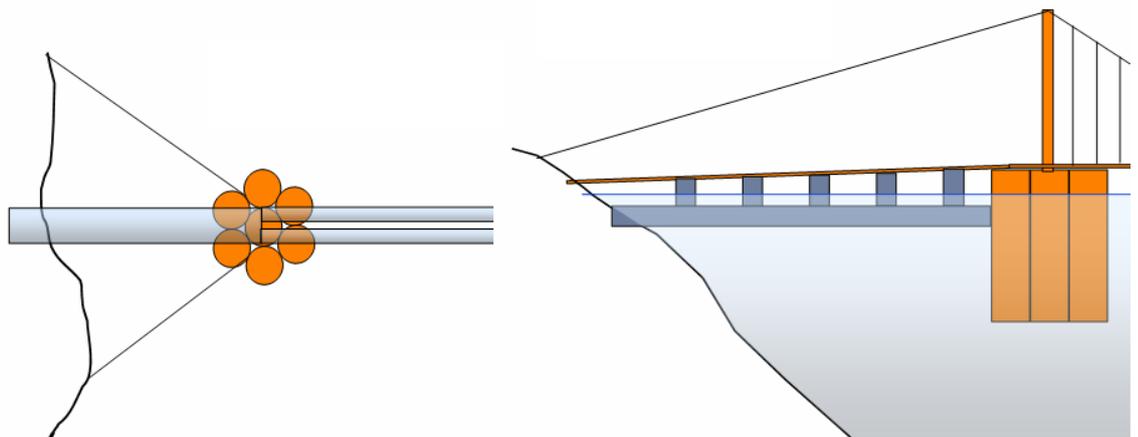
Pylon on pontoon connected to landside by heavy concrete structure. Pontoon may be additionally stabilised using horizontal cable anchors.
